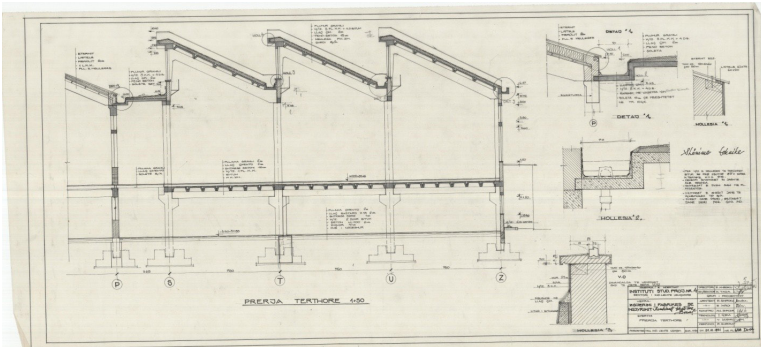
Section plan (Source – Central Technical Archive – Tirana)
